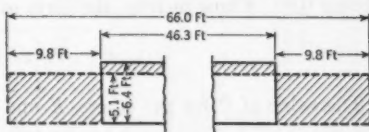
VARIATION OF NON-SILTING, NON-SCOURING SECTIONS, EAST HIGHLINE CANAL, AT B HEADING, IMPERIAL VALLEY, CALIFORNIA.
